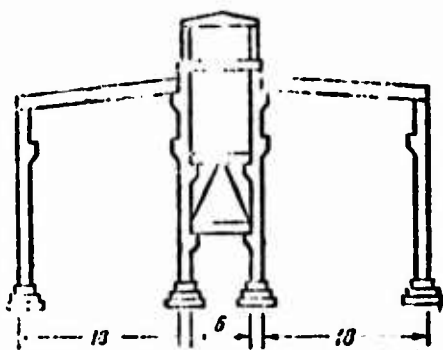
Multistage ferroconcrete frame with metallic joints in the plane of the frame.
